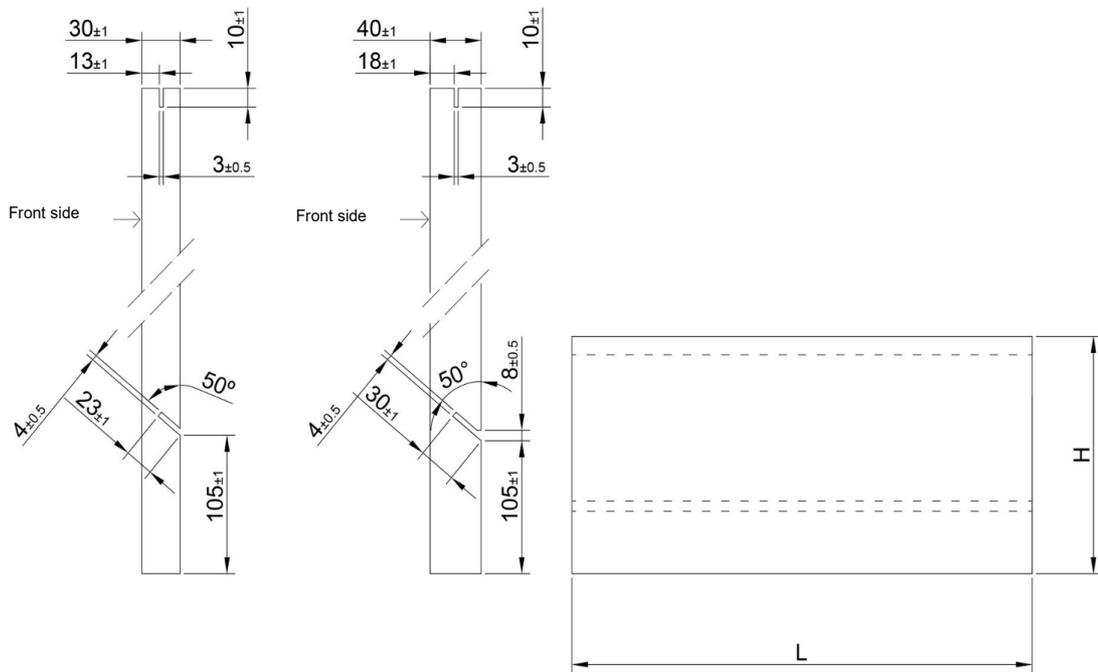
DETAIL OF SUBFRAME AND FIXING SYSTEM – VERTICAL SECTION
